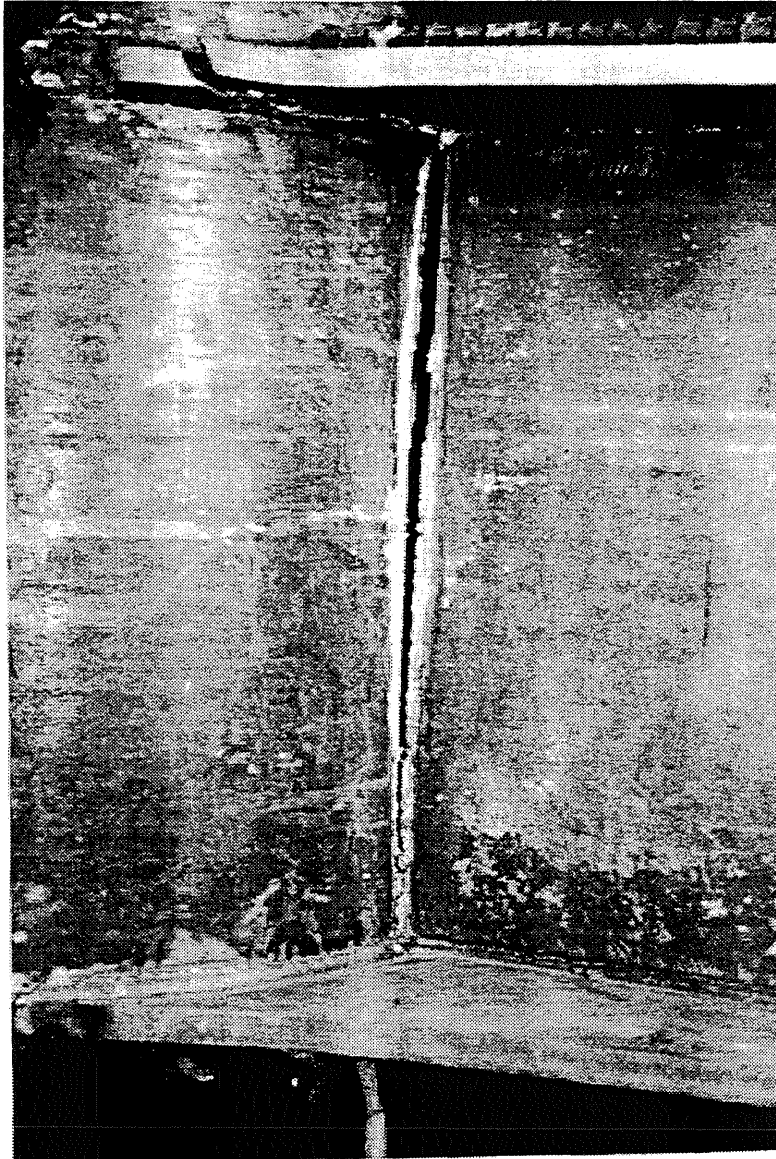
b. Failure of Connection *Type III*: Weld and Flange Fracture
